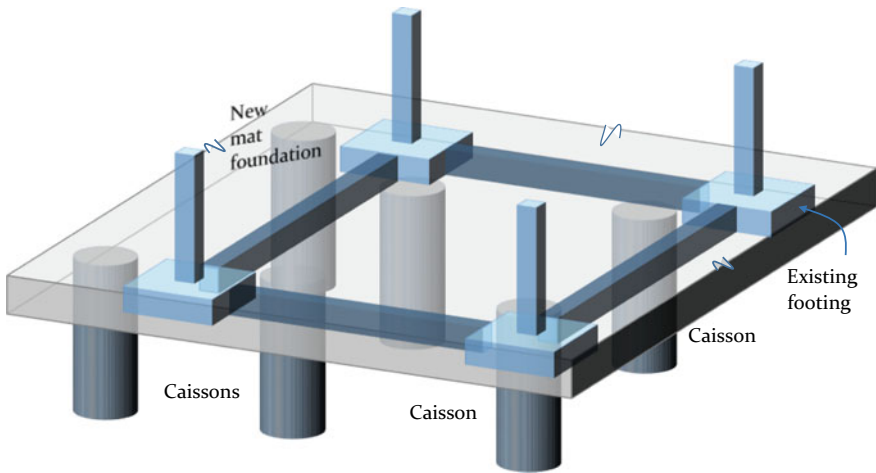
New mat foundation supported on newly cast plain concrete caissons
